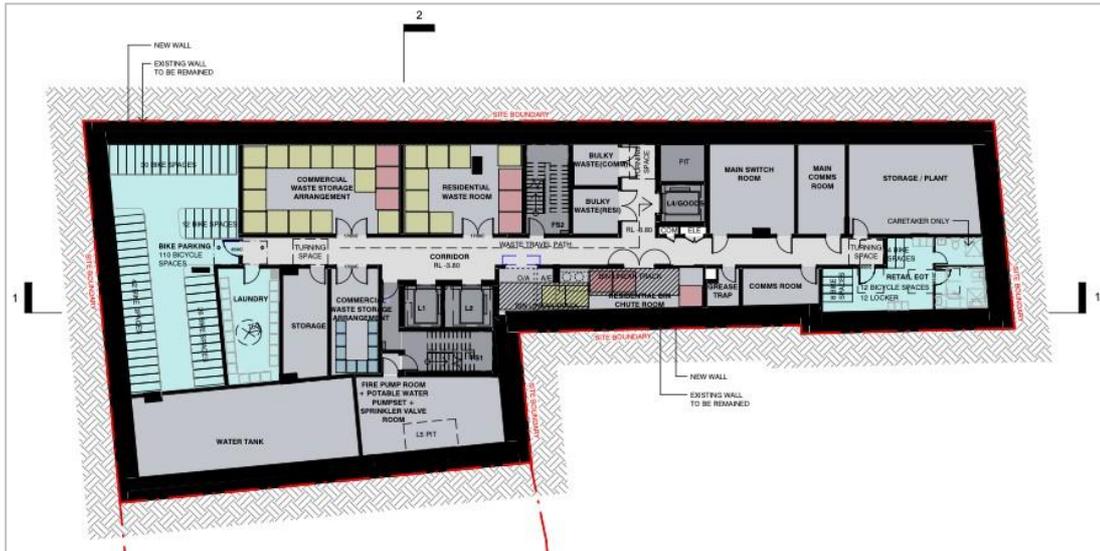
Proposed Basement 02 (extract from DA-10-0800 T)
